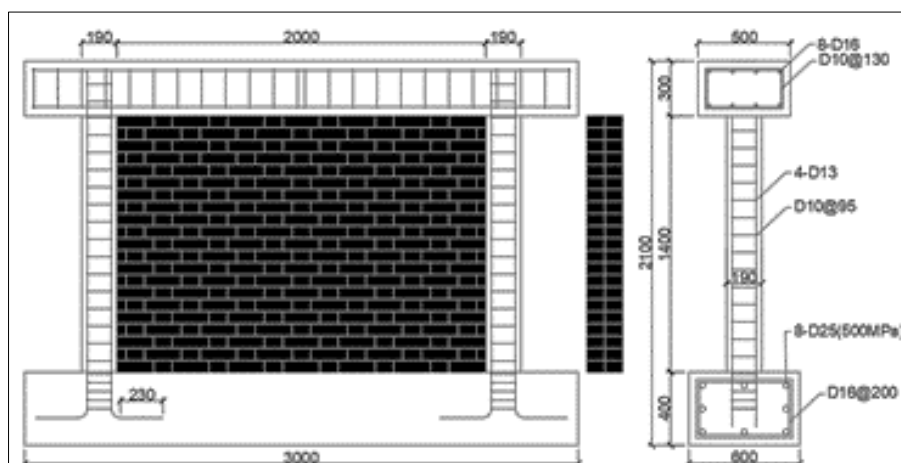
Details of masonry wall and reinforced concrete frame (unit: mm)
